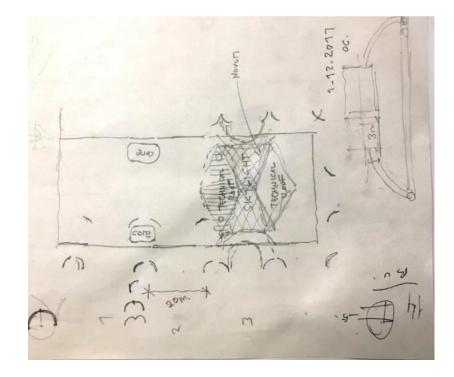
23. Tracing the Rhino drawing with the previous sketches and exploring possible light shelf and the entrance with the structural system. (Source: Office B)
